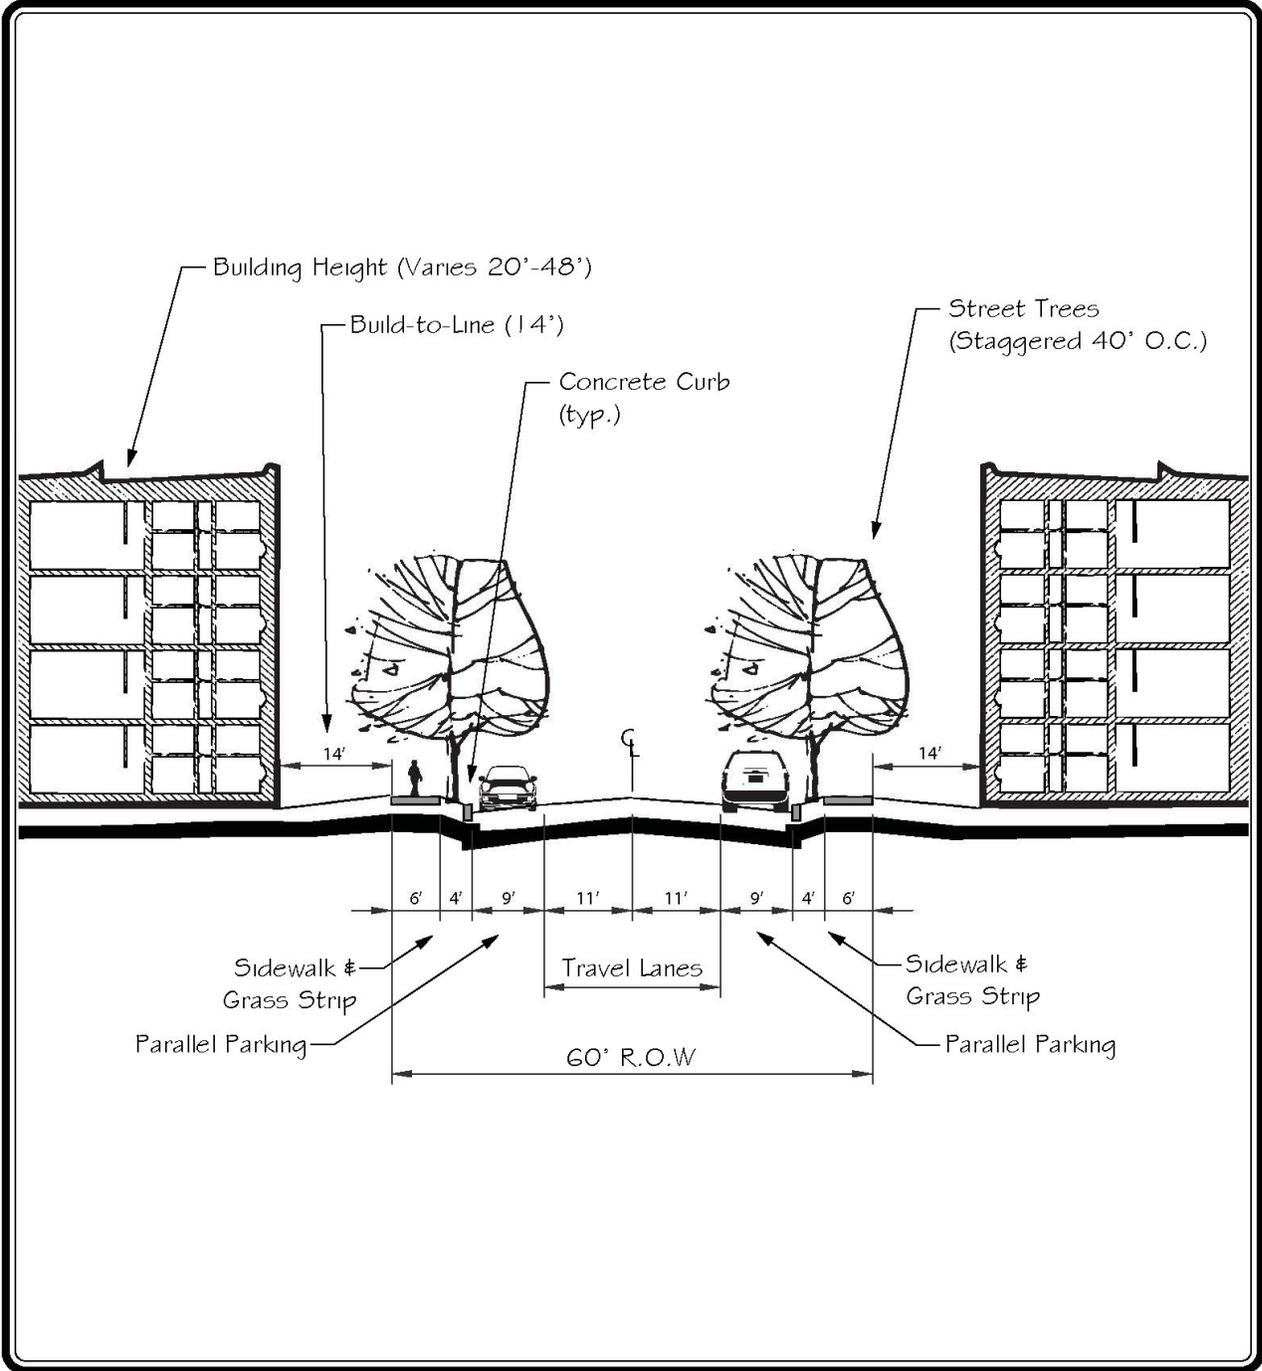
SECTION 314.05 - 02 TYPICAL COLLECTOR ROAD DETAILS WITH DOUBLE-LOADED PARKING
